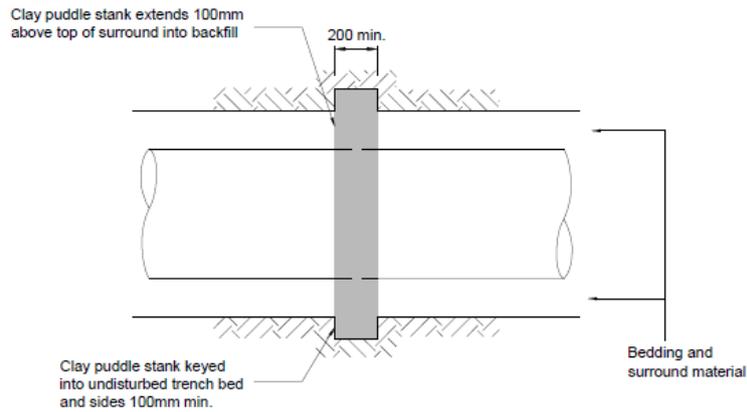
A Typical ‘Stank’ – Impervious Membrane to Trench Longitudinal Drainage
